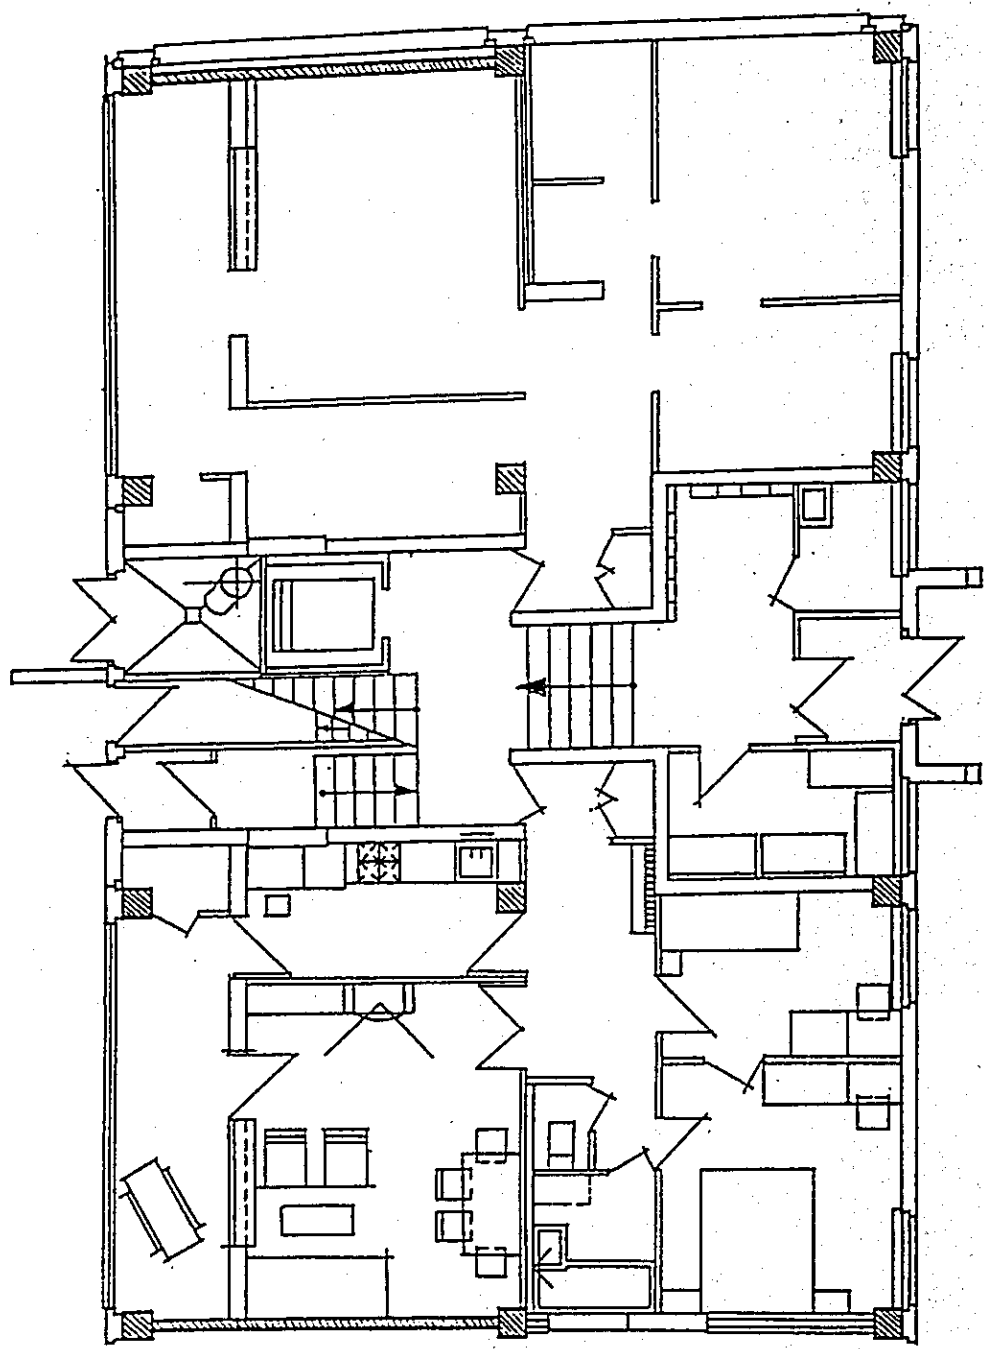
Plane of Apartment House of RPC Construction
